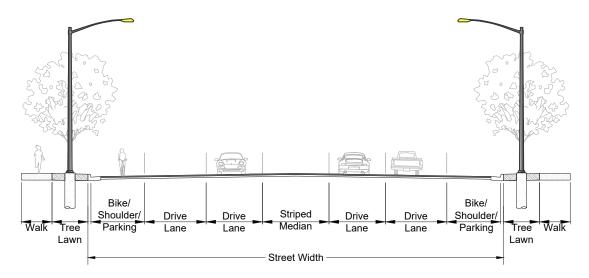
Typical Arterial with Non-Continuous Street Lighting Cross Section
